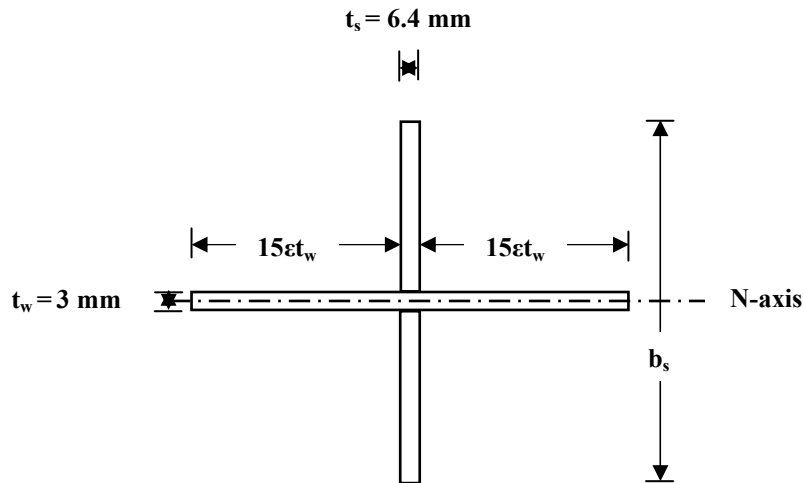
Required cross-section of load-bearing GFRP stiffeners for specimen B8
